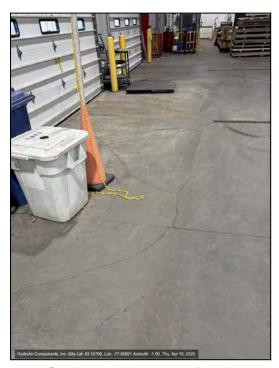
Small cracks in concrete floor in southwest loading area.
